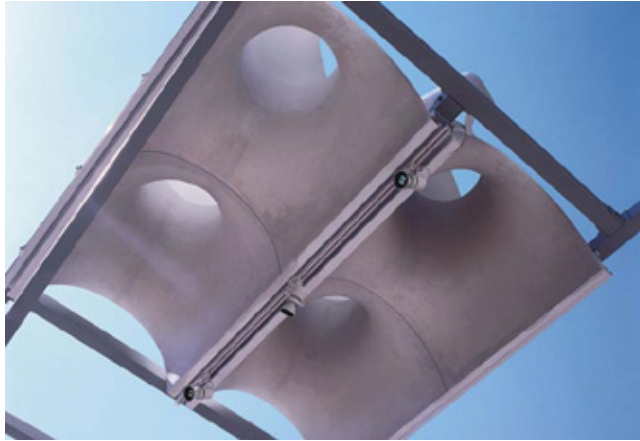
The prefabricated GFRG vaulted ceiling panels will link with the rooflights and sun cowl
